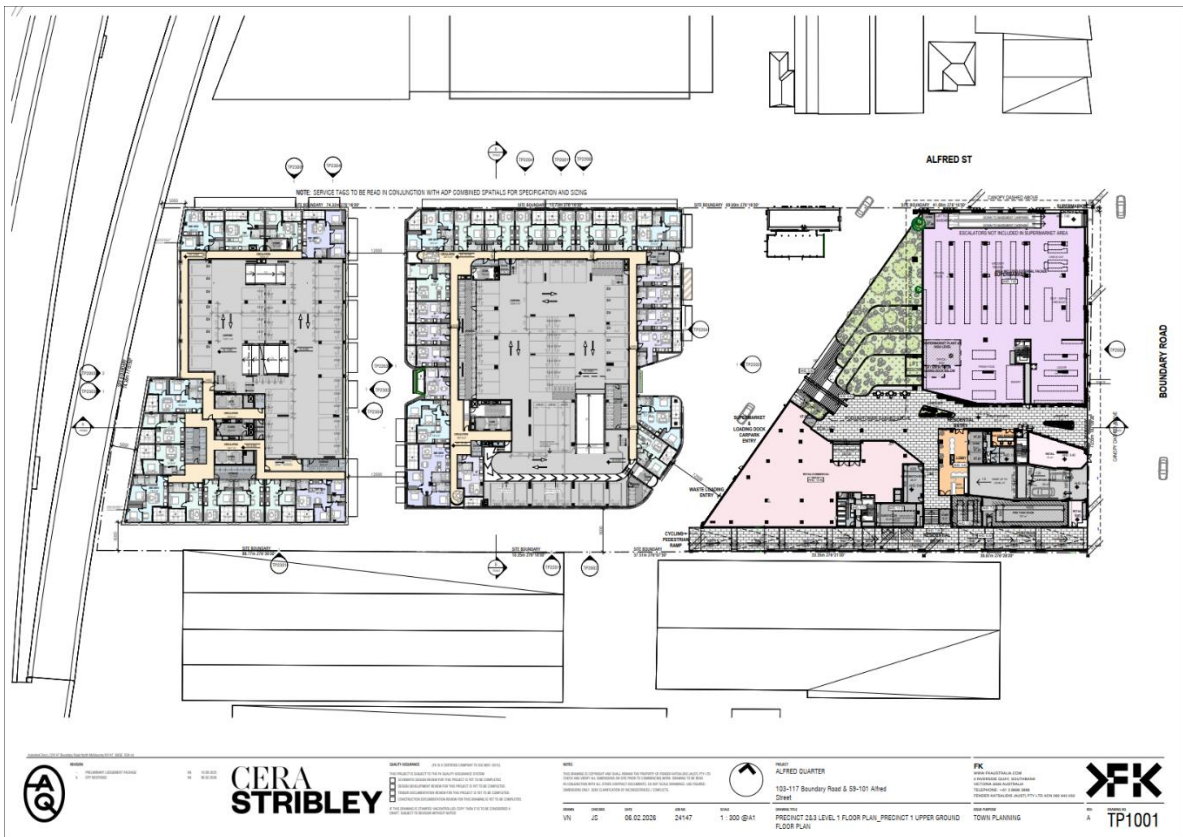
Precinct 2&3 Level 1 Floor and Precinct 1 Upper Ground Floor Plan
